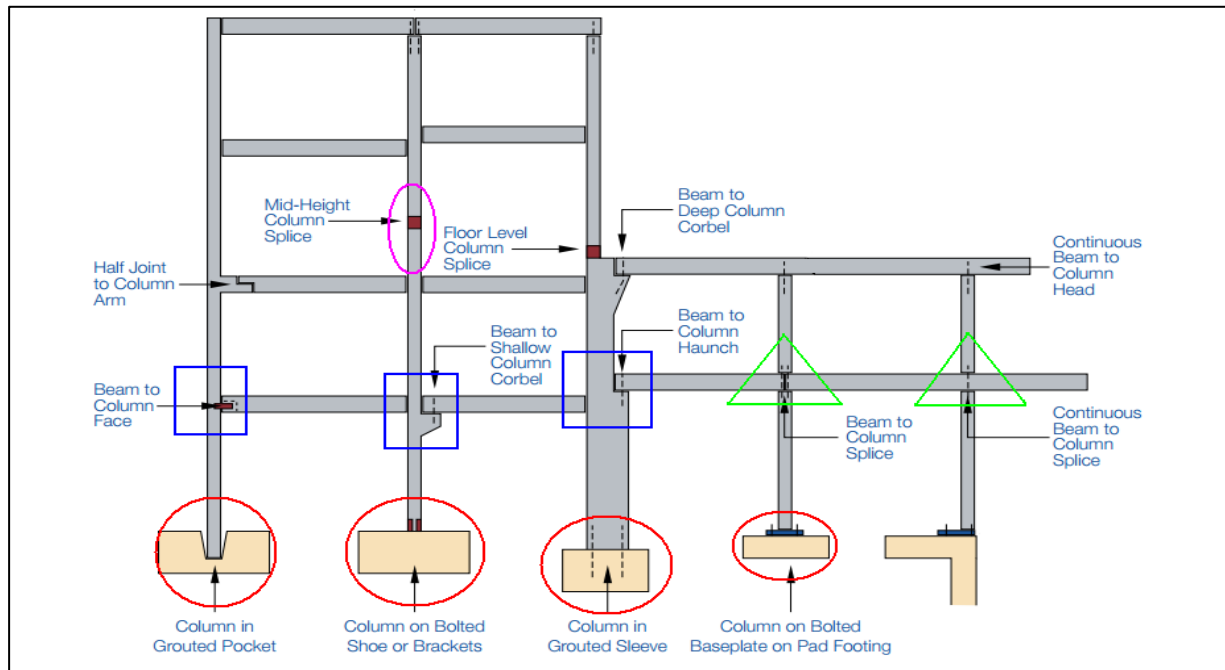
Typical connections found in precast structures (Walraven 2013)
